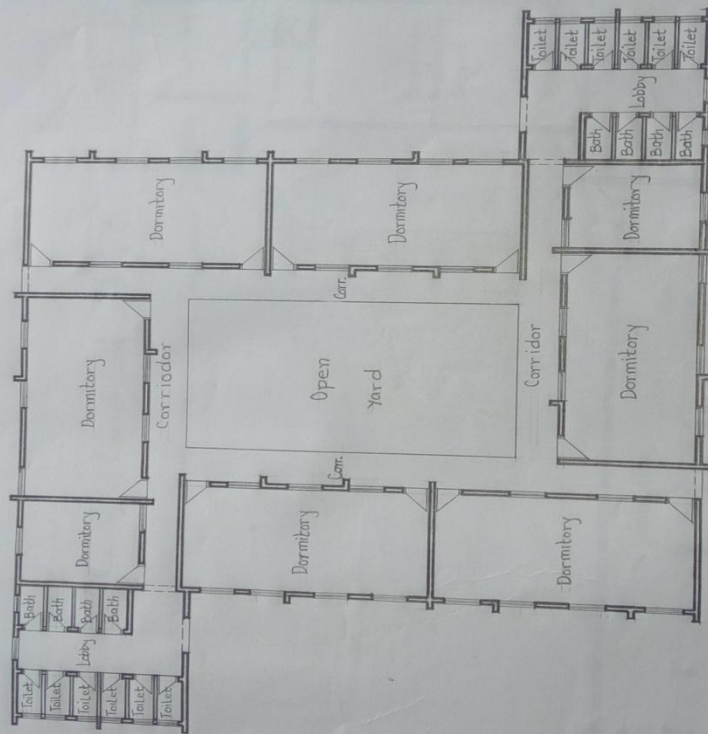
Hall Floor Plan of case study two of NYSC Orientation camp, Ede, Osun State.
